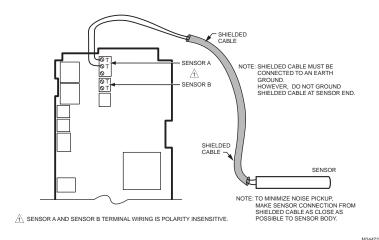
Sensor Wiring — Showing Shielded Cable Connection to Sensor A.
